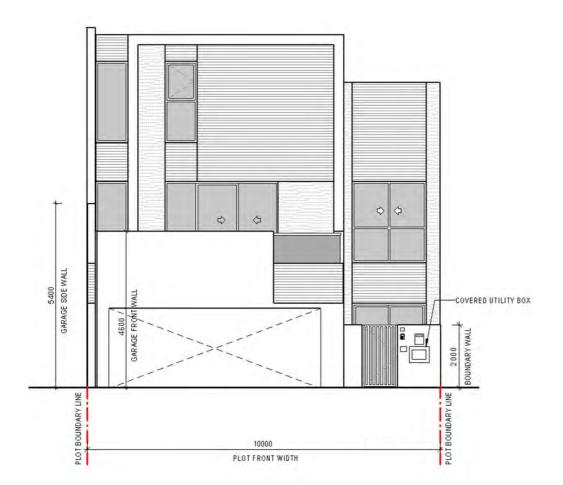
Front Elevation showing boundary wall and entrance for Villa 3.3 / Sabaah
